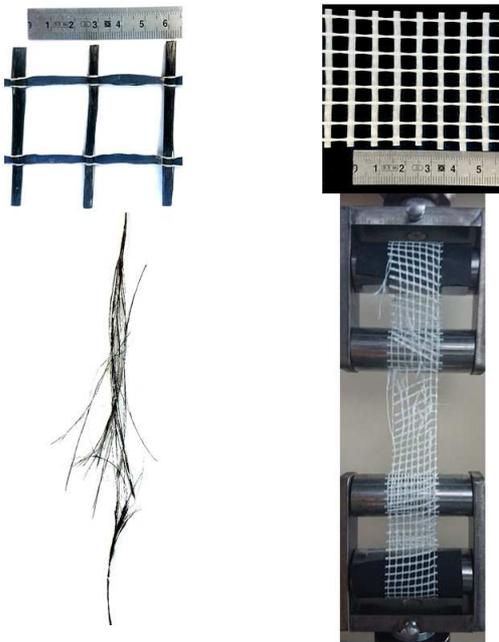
Base carbon fabric (left top), base glass fabric (right top), tested and failed carbon roving (left bottom), failed fabric strip mounted for tensile test (right bottom)
